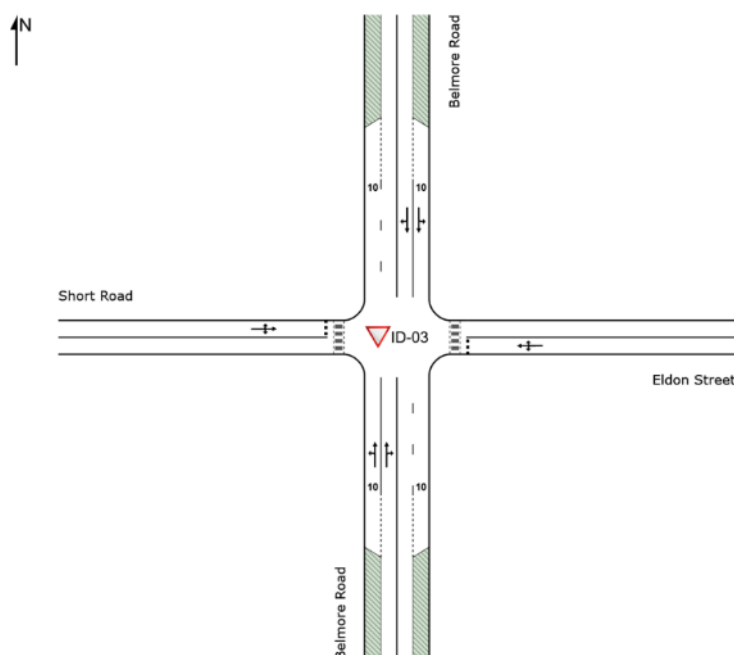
Belmore Road/Short Road/Eldon Street intersection layout
